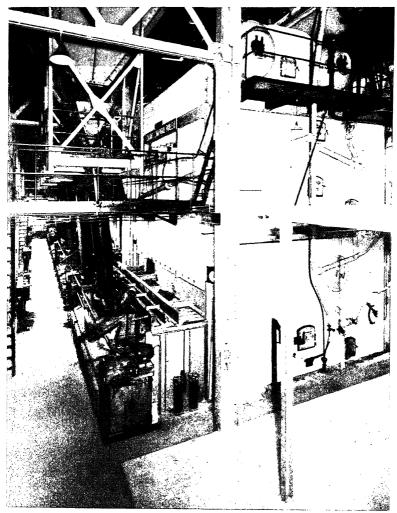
Plate XIX. Range of four Water-tube boilers for heating of large Government Depot (see p. 316)
